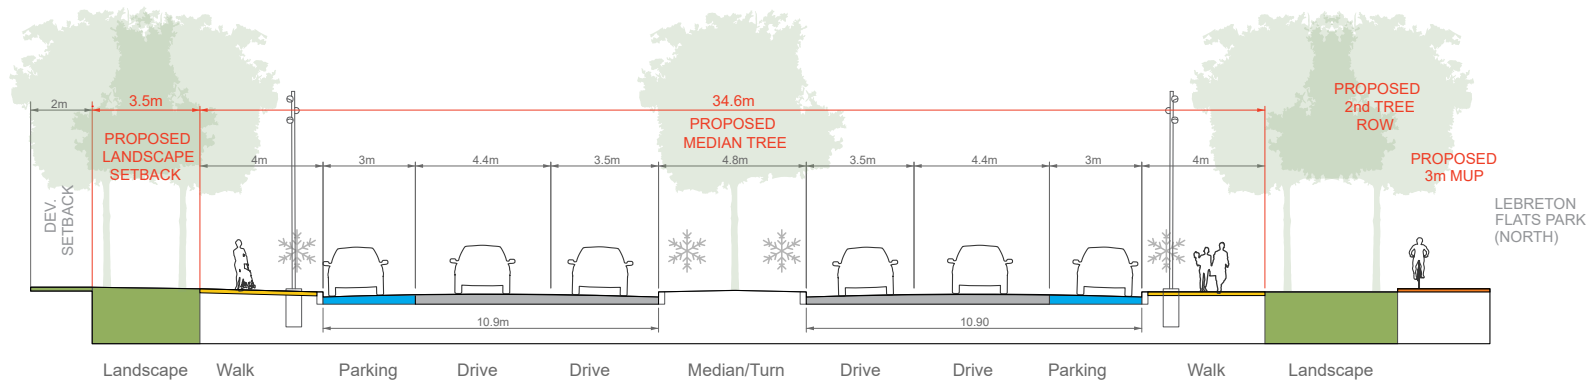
| Proposed modifications to the public realm: Wellington Street, between Vimy Place and Booth Street (34.6 m) (Red labels indicate changes to existing conditions.)
